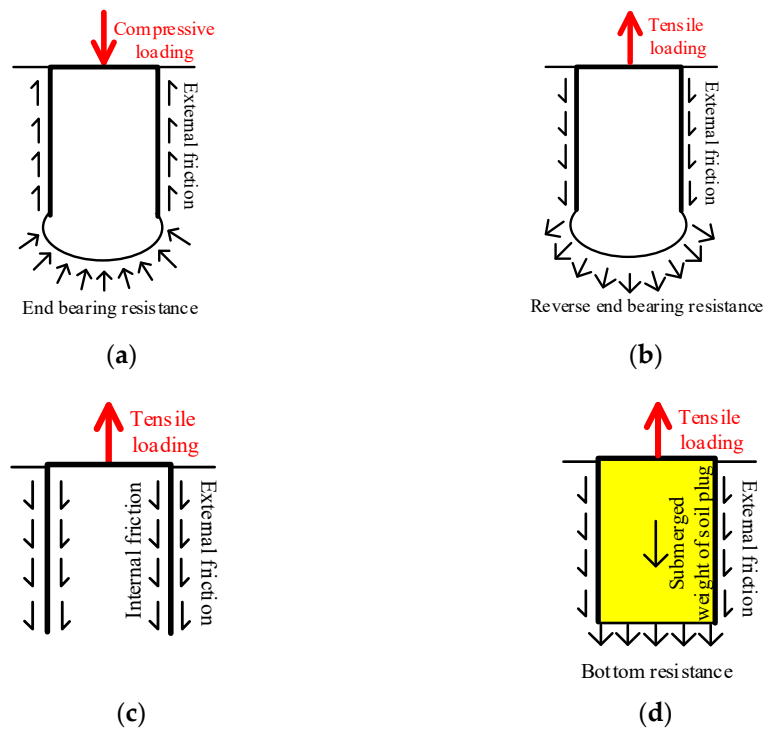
Resistances under compressive and tensile loadings: (a) End-bearing mechanism; (b) Reverse end-bearing mechanism; (c) Siding mechanism; (d) Pulling-out mechanism.
